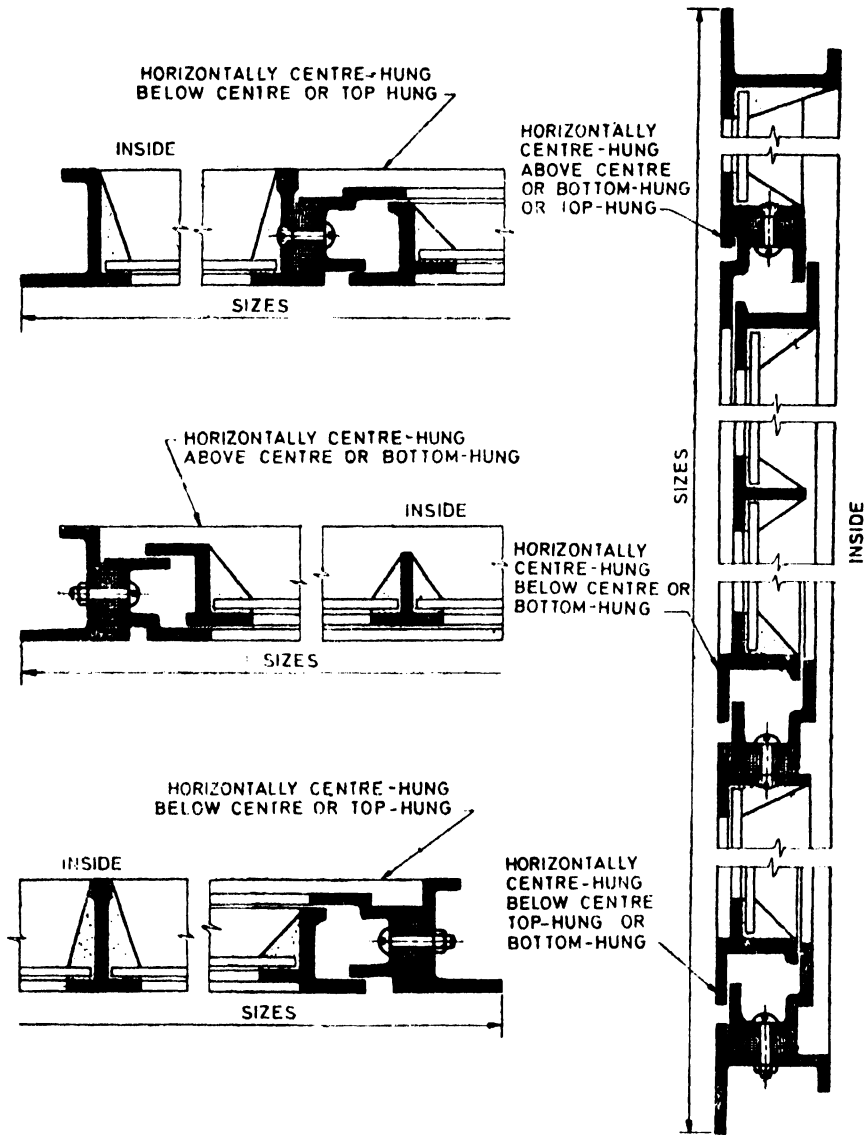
SECTIONAL DETAILS THROUGH SASHES
